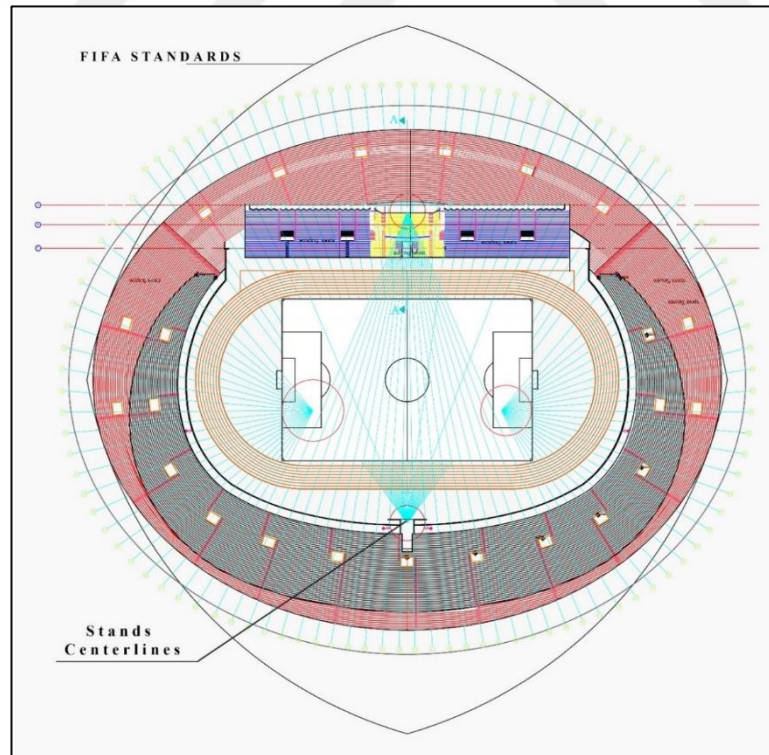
6 New stadium plan proposal. (Drawn by the author Abdullah Allawi)
